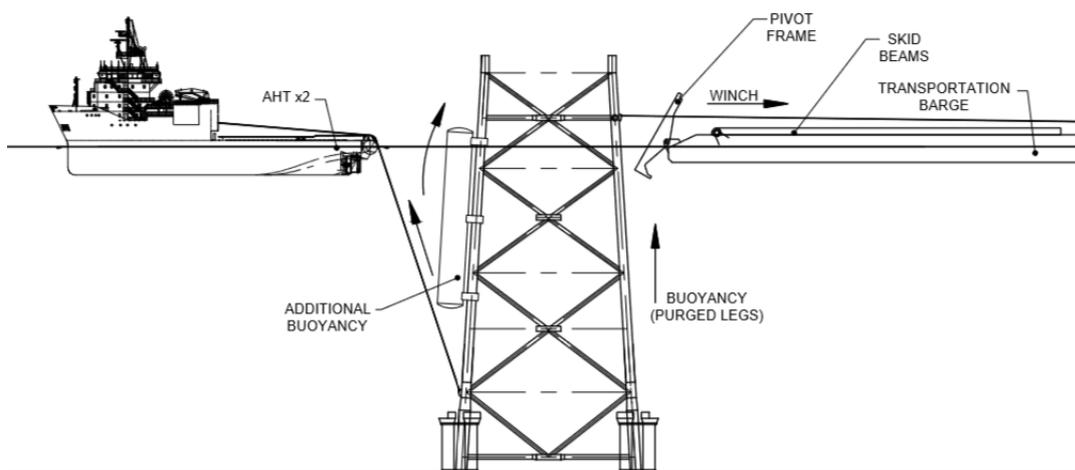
Reverse install of jackets using an especially constructed barge with pivoting skid beams.
